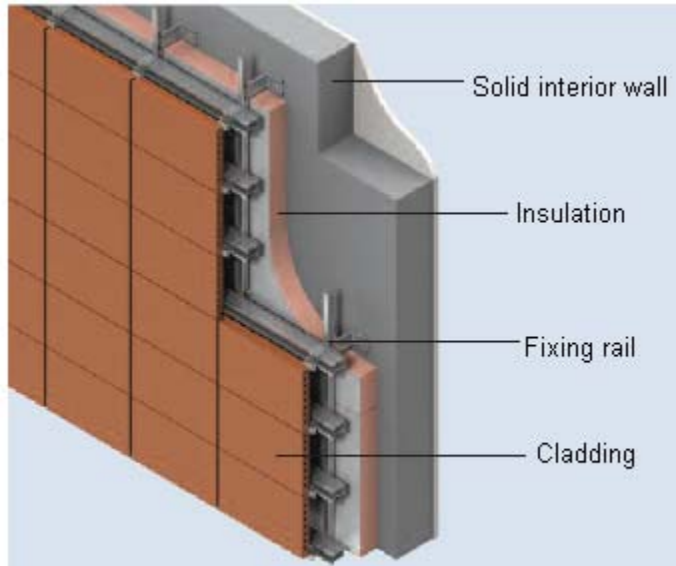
, example of a dry cladding system (Adjusted from: Kingspan 2011a)
